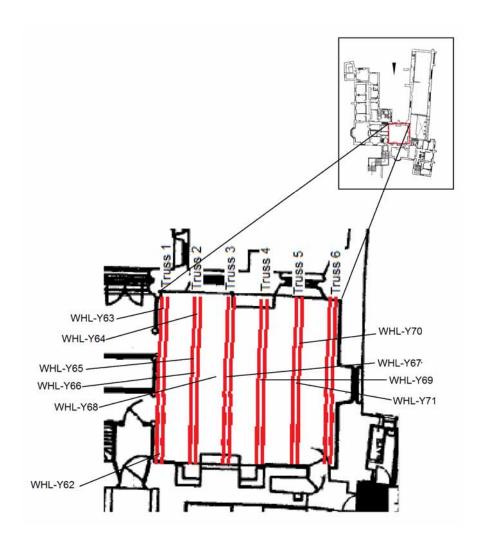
Plan of the great hall, showing the location of samples WHL-Y62-71 (Ashworth Burke Partnership)
